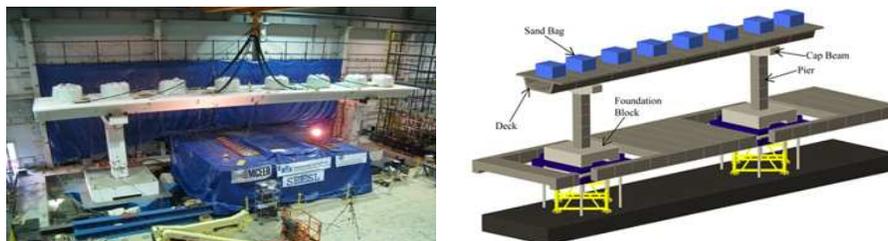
Half-scale post-tensioned segmented bridge system (Sideris et al 2010)
